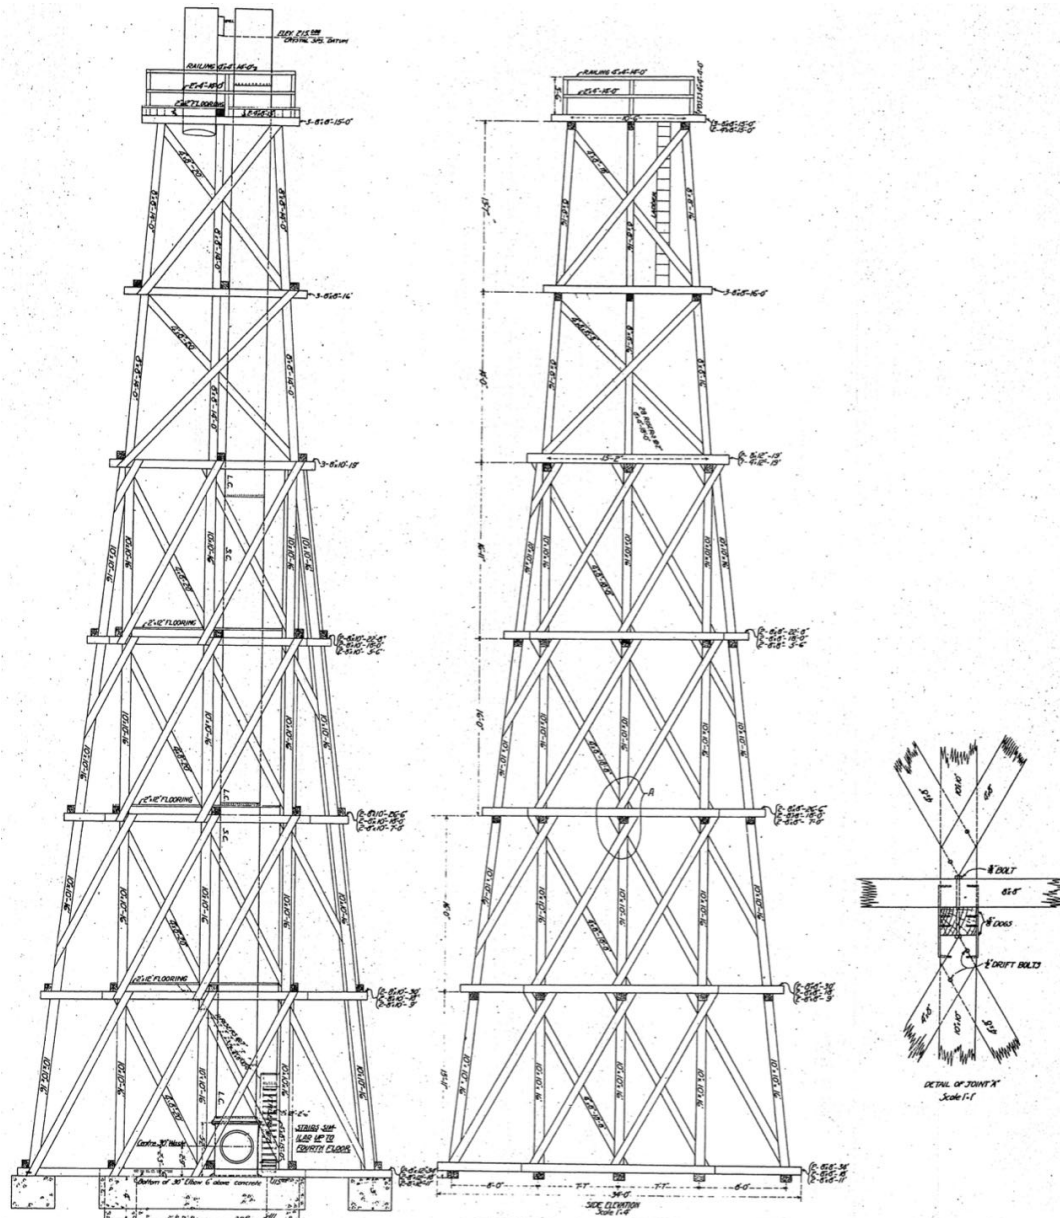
Millbrae Standpipe, Constructed 1898 (SVWC)
